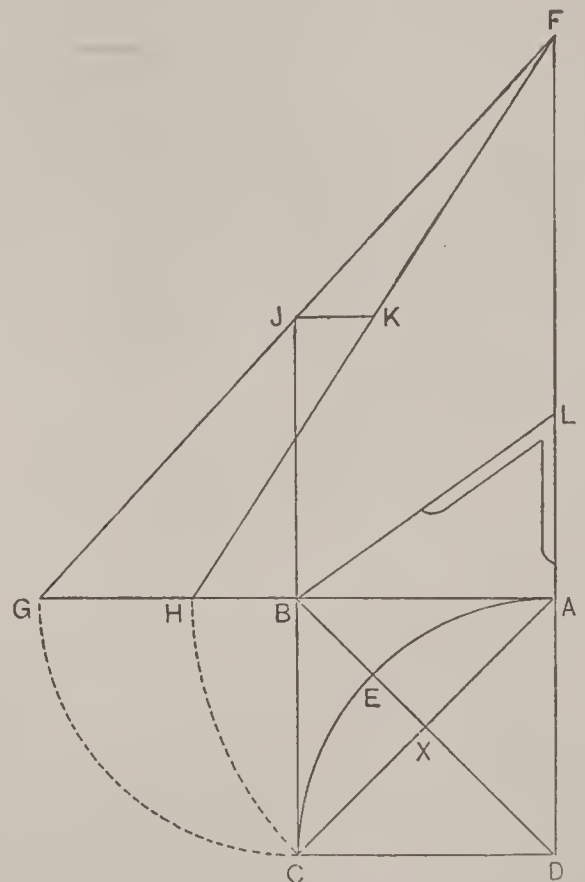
SHOWING QUARTER-CYLINDER, GROUND PLAN AND ELEVATION.
